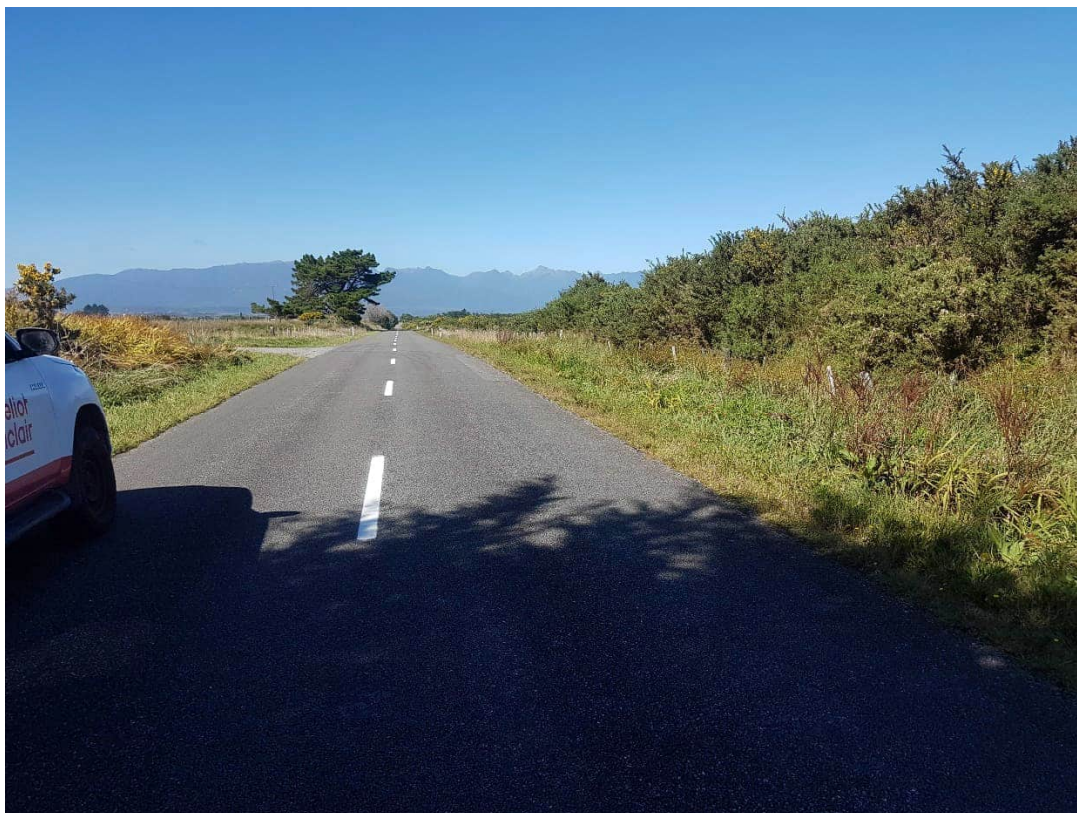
Photo looking south along Wilsons Lead Road from main access point to site
